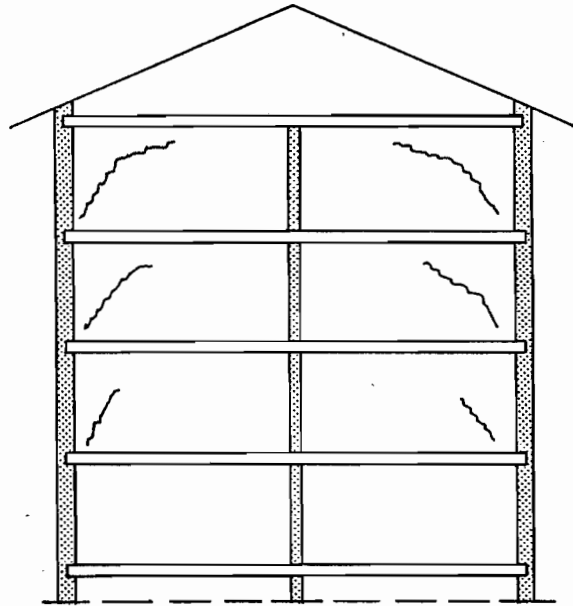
Crack in a multistorey-building with higher shrinkage of the inner wall
